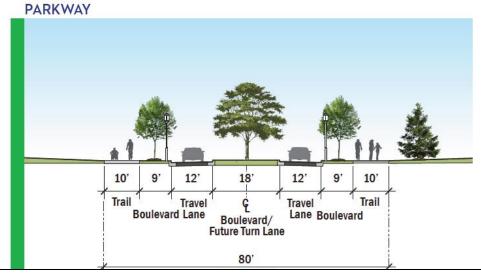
2040 Comprehensive Plan Roadway Elevation for Parkway from p. 7-6
